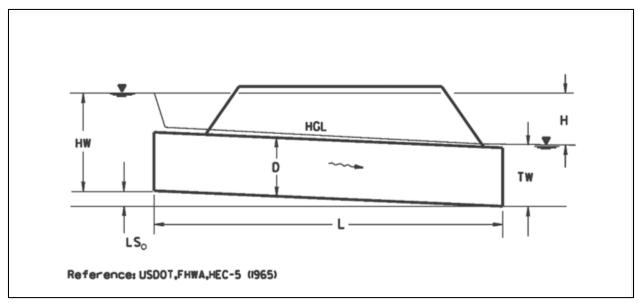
Tailwater for Submerged Outlet Conditions
